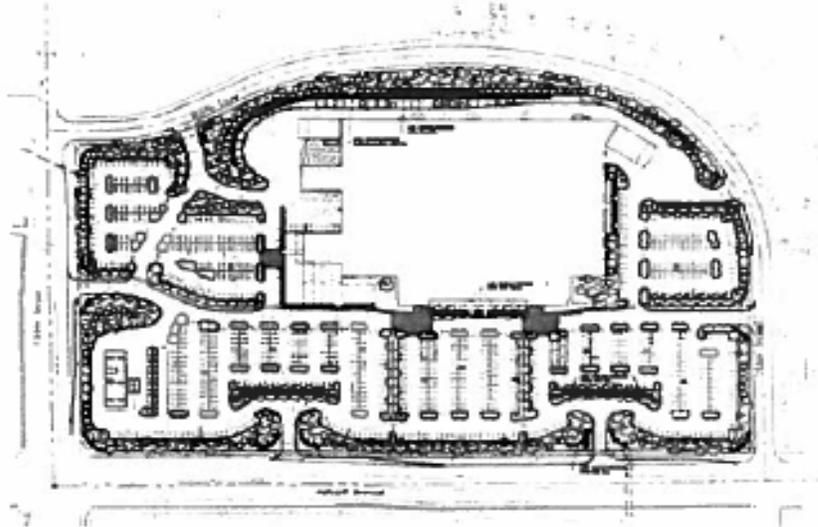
A minimum of 30% of the off-street surface parking spaces provided for all uses contained in the development’s primary building shall be located other than between the front façade of the primary building and the primary abutting street (e.g., to the rear or side of the primary building(s)).
